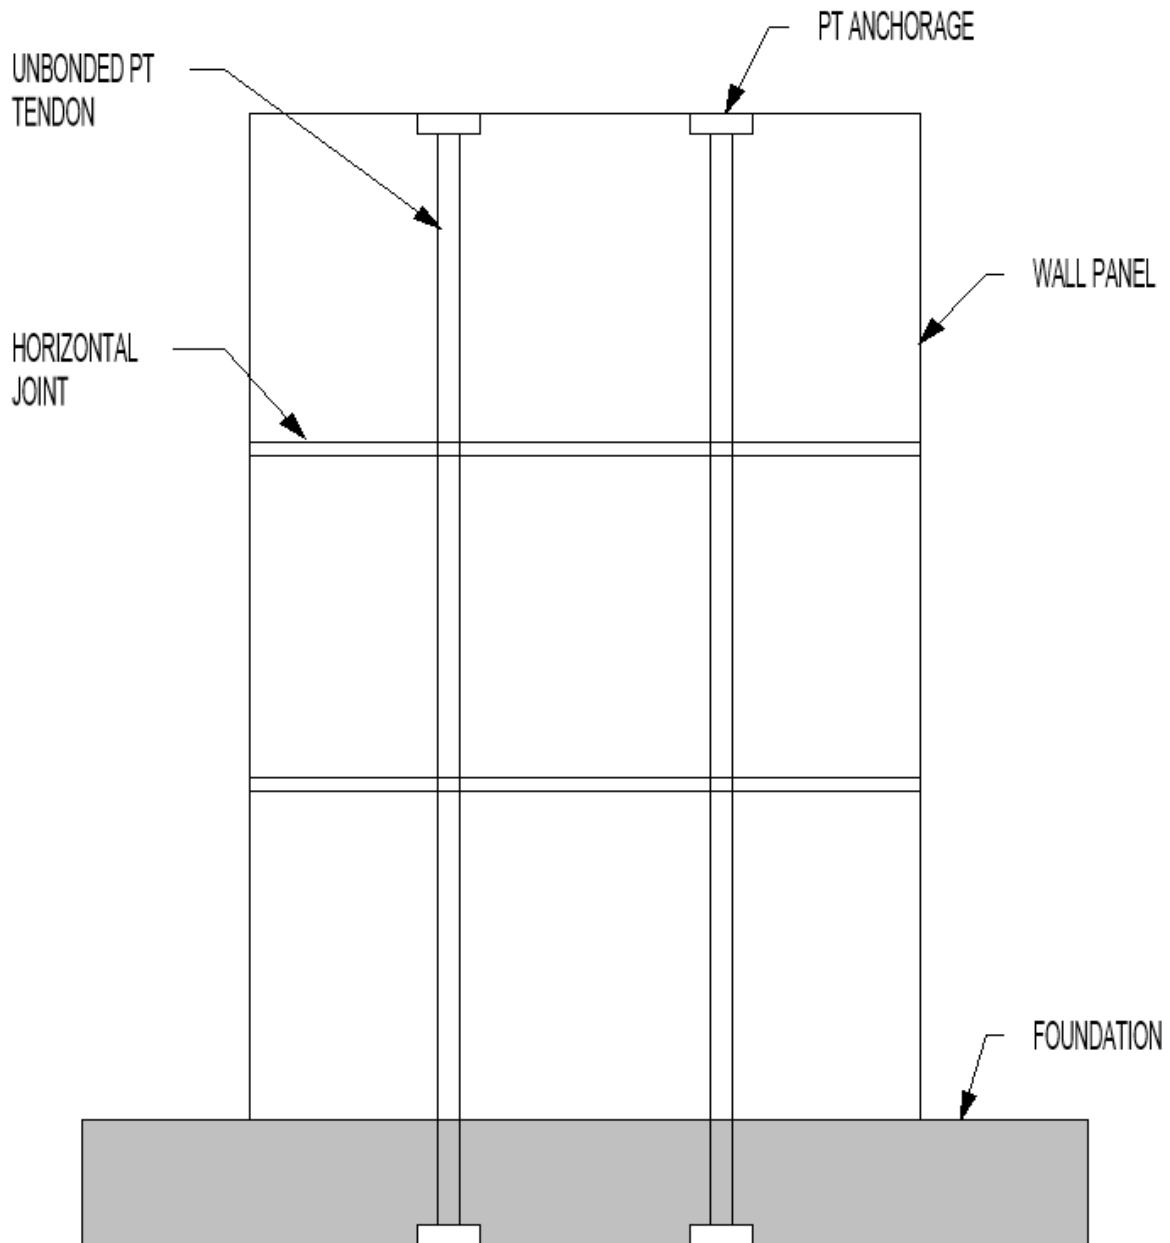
Elevation of Special Unbonded Hybrid Posttensioned Split Precast Shearwall [3]
